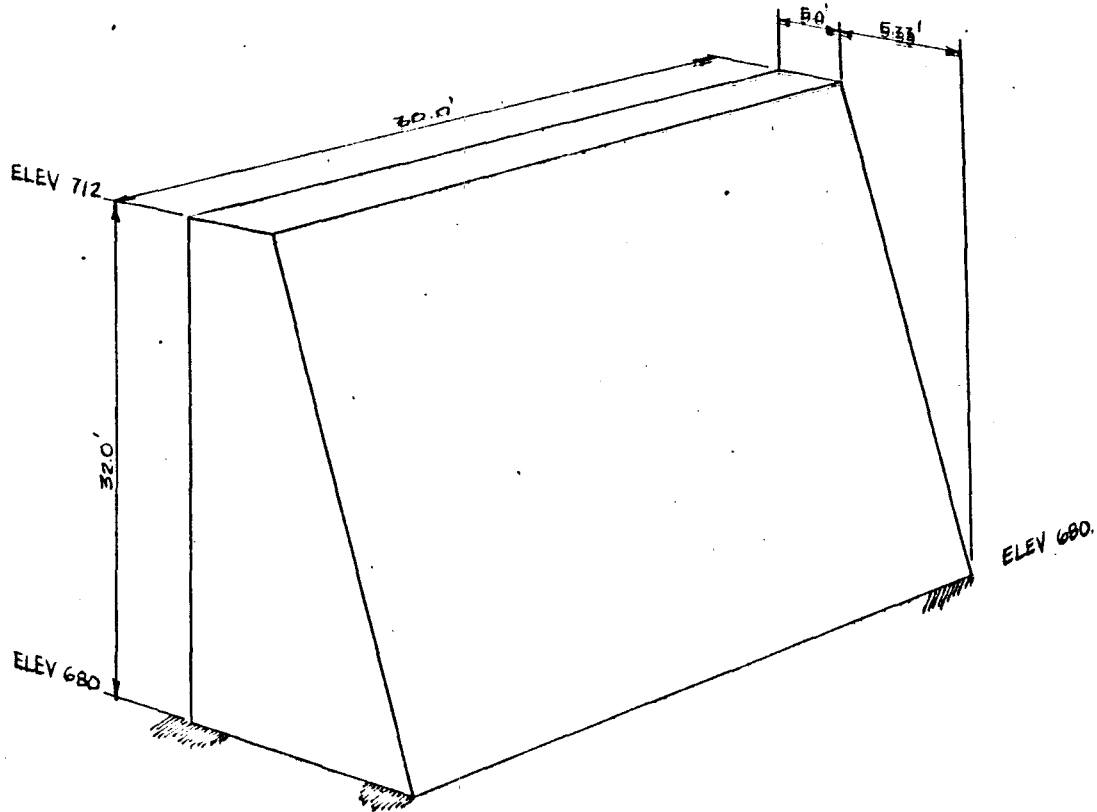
LANDWALL - LOWER GUIDE WALL MONOLITH L-68
